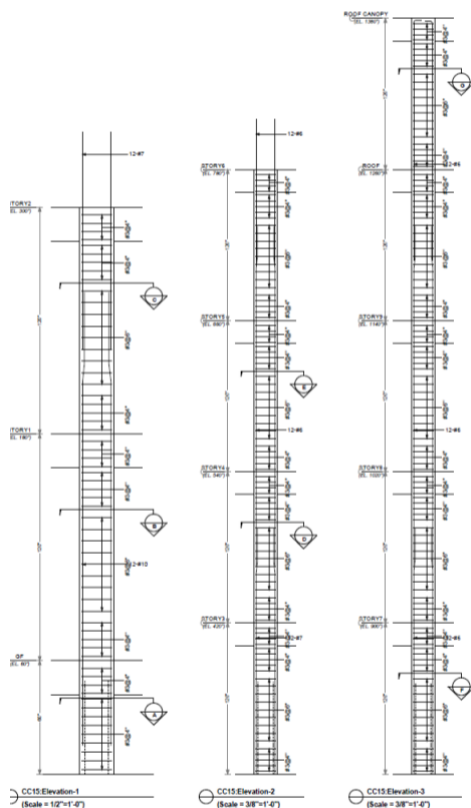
Column 33 & 34 (Longitudinal Rebar)
